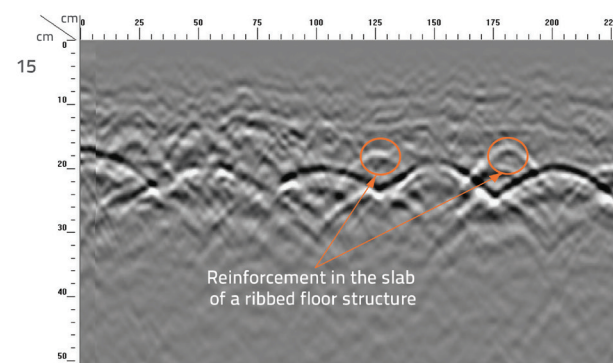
Determination of the presence of reinforcement in the slab of the ribbed floor structure
